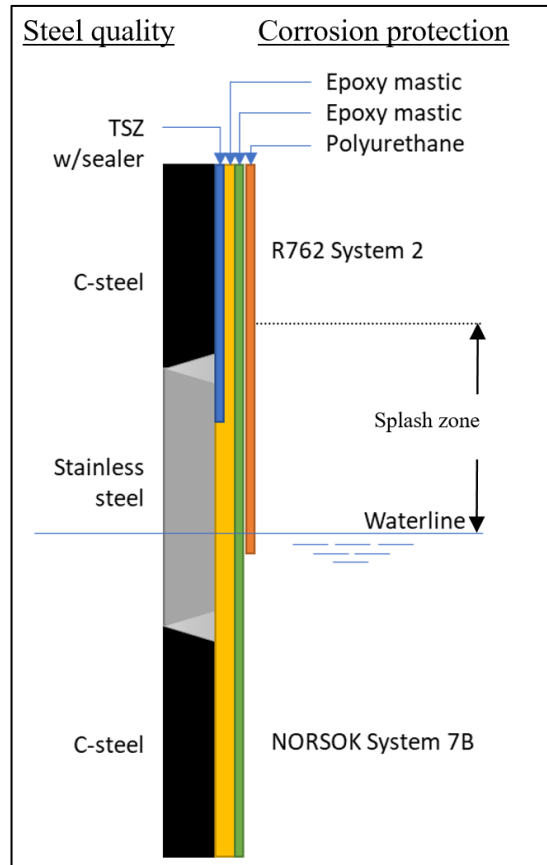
Example of corrosion protection build-up over a weld in accordance with /8/
